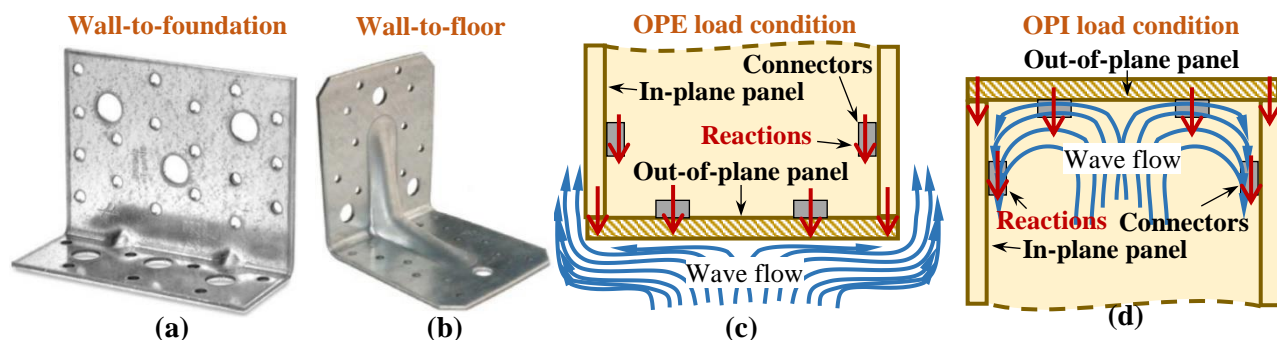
(a) Wall-to-foundation, (b) wall-to-floor connections, and (c) OPE and (d) OPI load conditions investigated [9]
